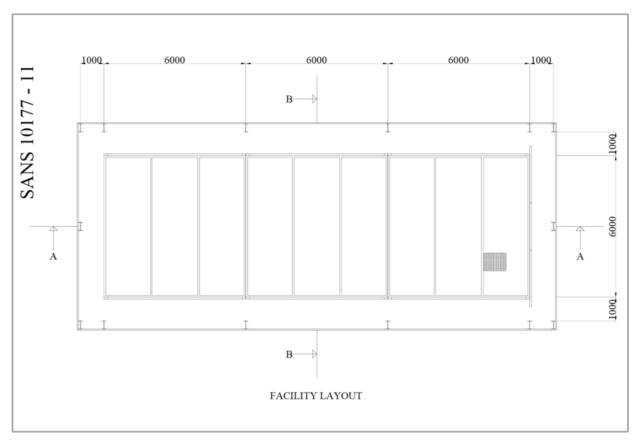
SANS 10177 - Part 11 test facility with specimen frames
